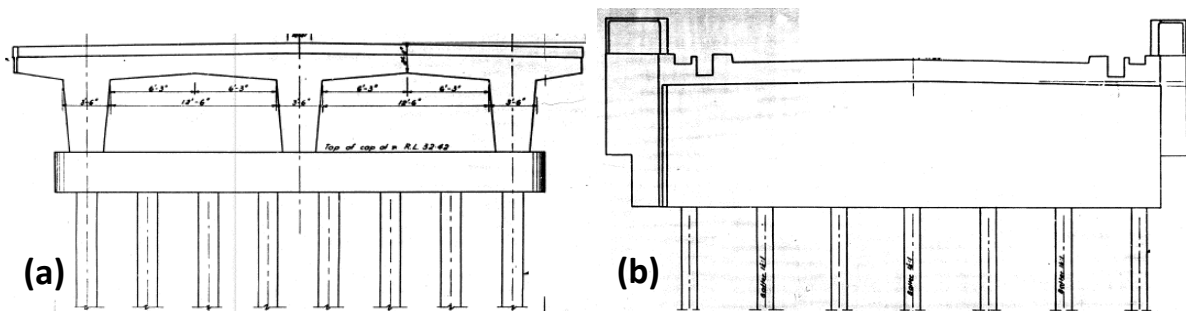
Avondale Bridge pile layouts, (a) pier piles, (b) abutment piles
